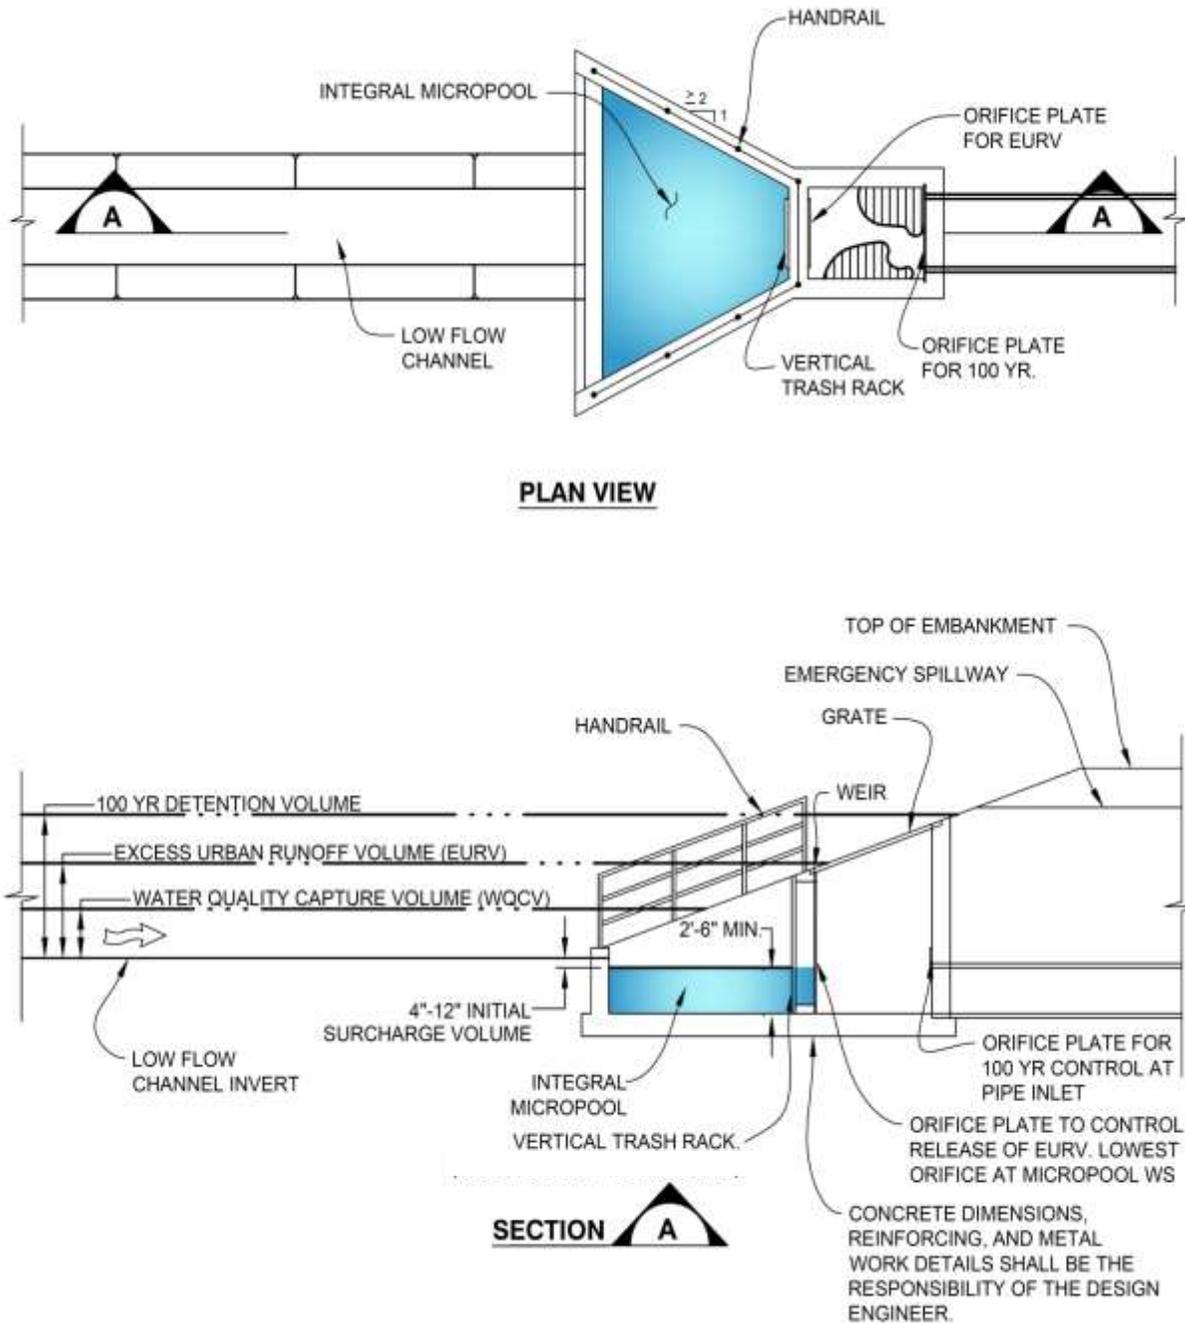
Concept for Outlet Structure with Flared Wingwalls and Handrail (Integral Micropool Shown)
